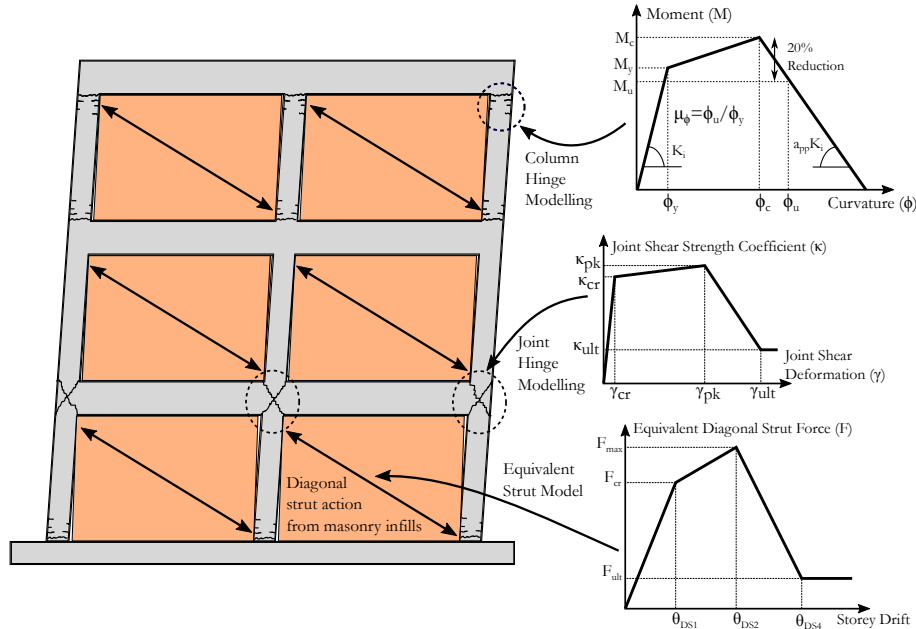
Illustration of the numerical modelling of the various damageable components of GLD RC frames with infills. The hysteretic behaviour of the beams, columns, beam-column joints and masonry infill struts are also illustrated.
